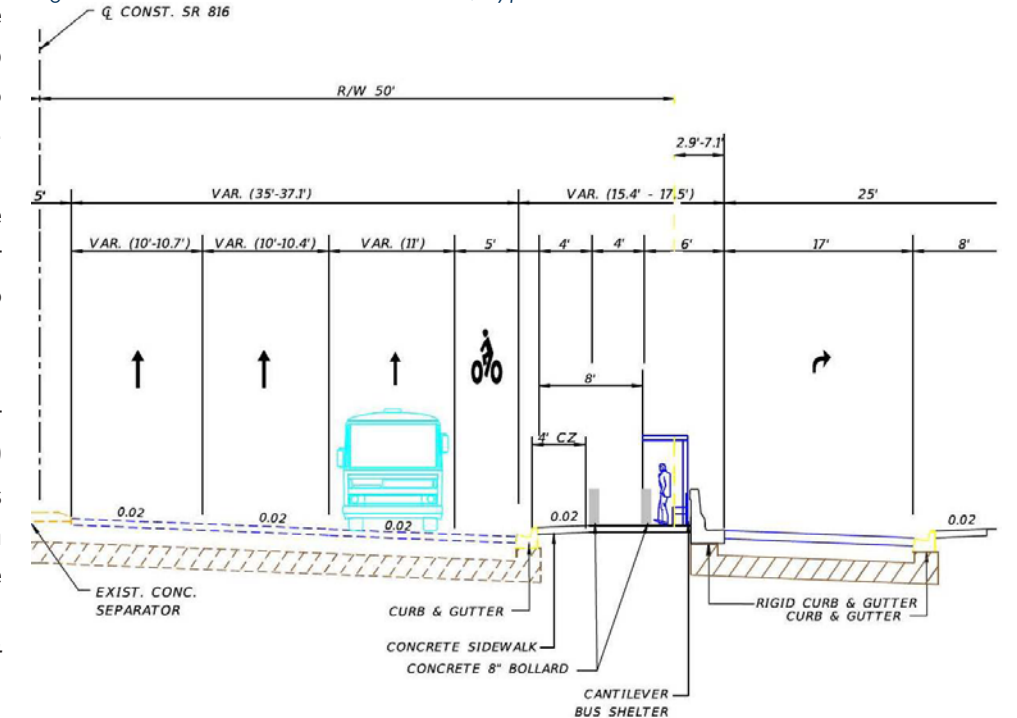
Bus Island with Barrier Wall, Typical Section
